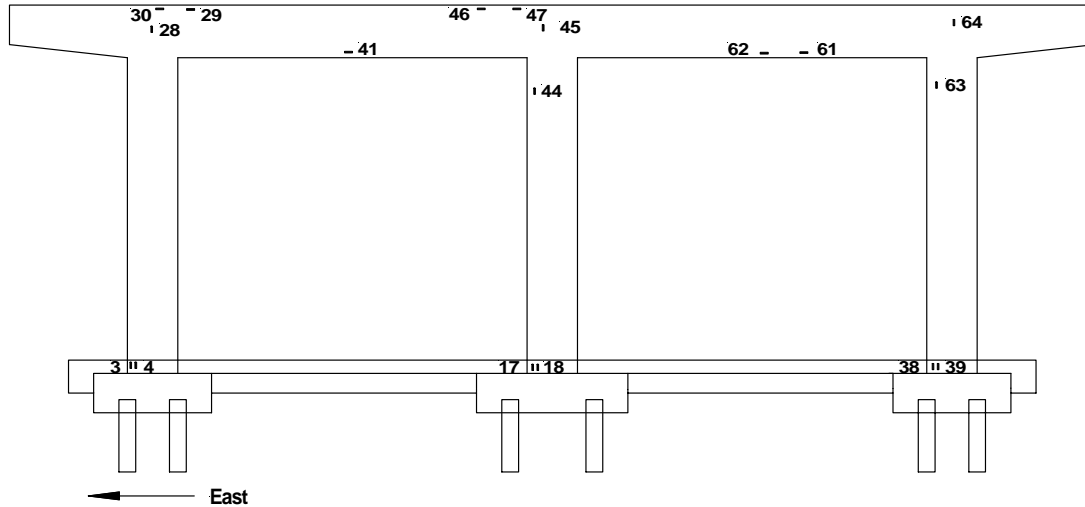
Location of the internal strain gages on the reinforcement for the Bent #6S 2000 test
